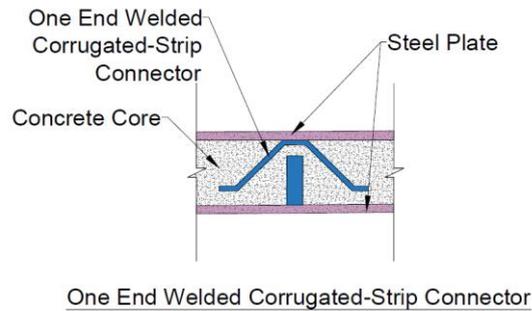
SCS sandwich with One End Welded Corrugated-Strip shear connectors.
